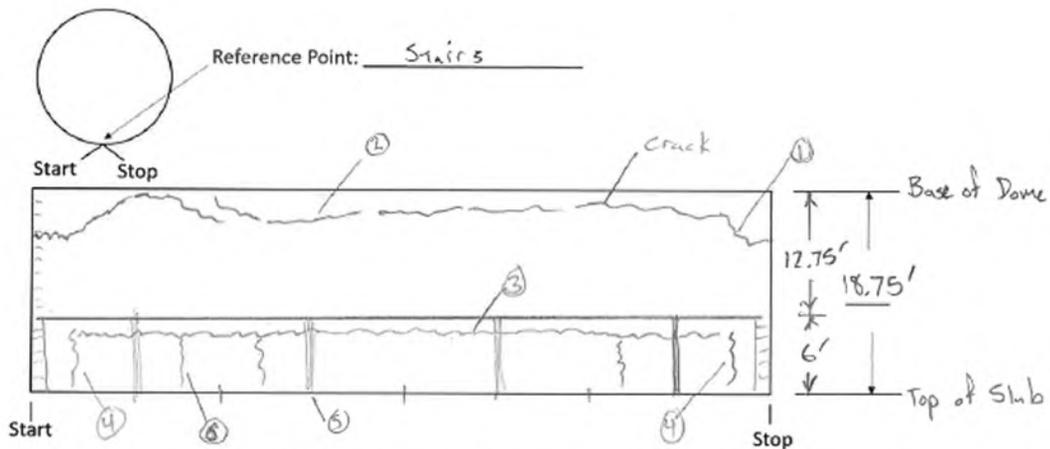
Reservoir INTERIOR WALL Elevation– Note location of ladders and other features.
